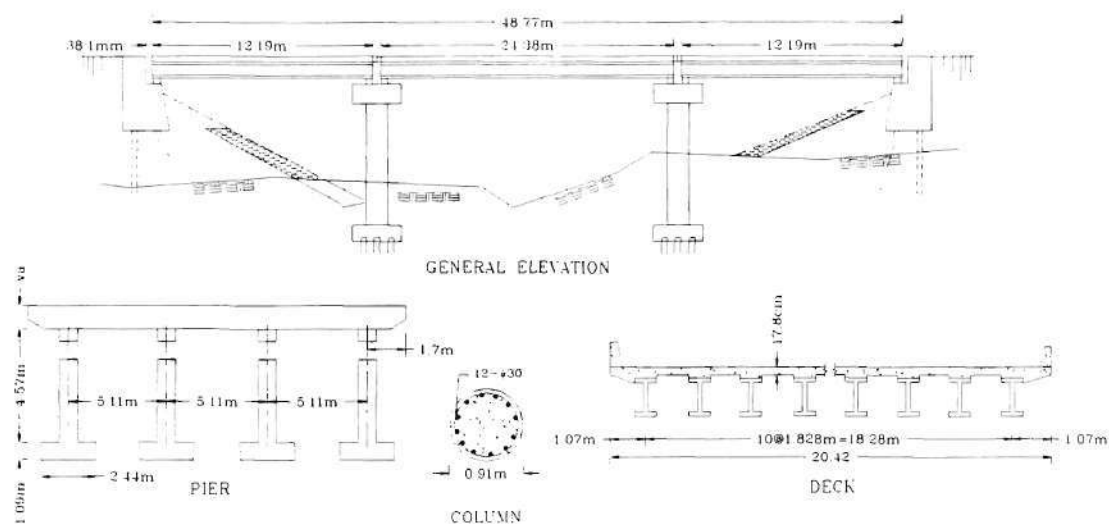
Typical Multi-Span Simply Supported Bridge.
